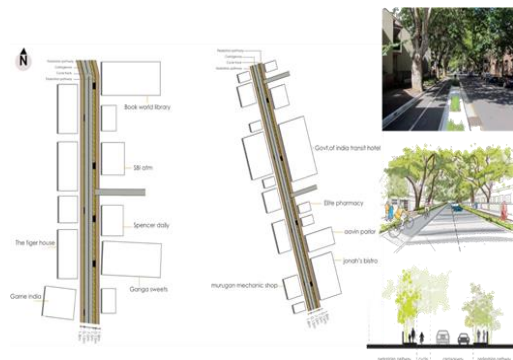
Street plan of Besant Nagar 2nd Avenue
